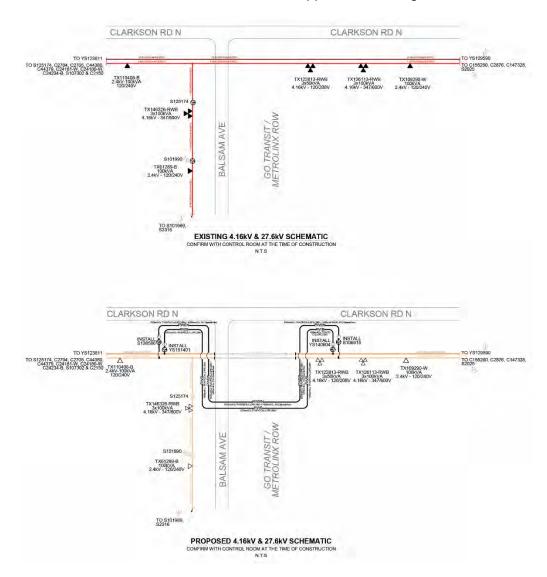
Schematic diagram showing the existing and proposed electrical lines within and adjacent to the subject site. (Source: Metrolinx GO Elec. LWL – CONFLICT #LW26 Clarkson Road North-Lakeshore Road West to Truscott Drive, Primary Schematic, Sheet No. D07-396295-001)
